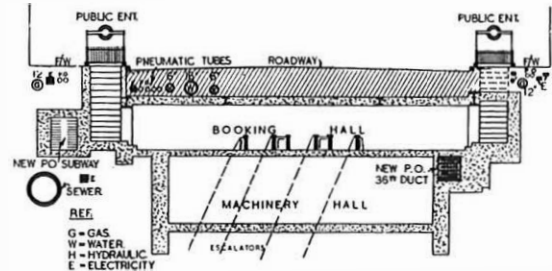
CROSS SECTION OF HOLBORN AFTER THE DIVERSIONS.
